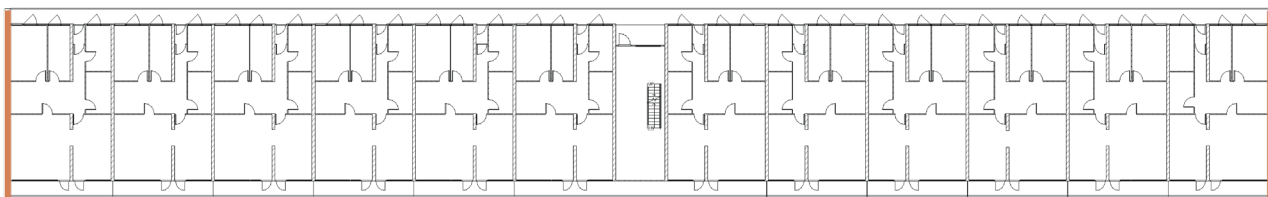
| Floor plan Highlighting Facade Type Glazing Facade and Full Cover Facade (Priemus, Van Elk, 1971)
